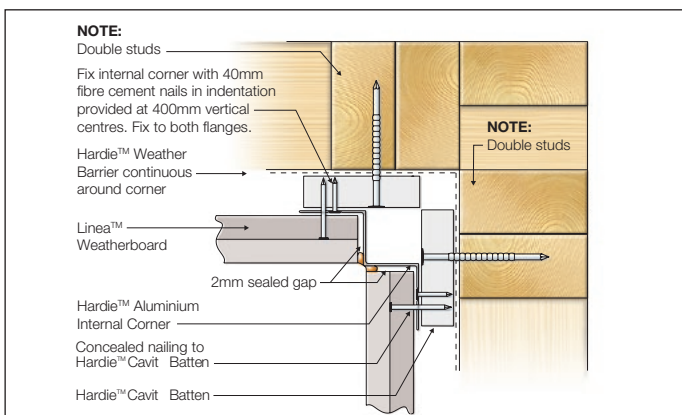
INTERNAL CORNER MOULD DETAIL
